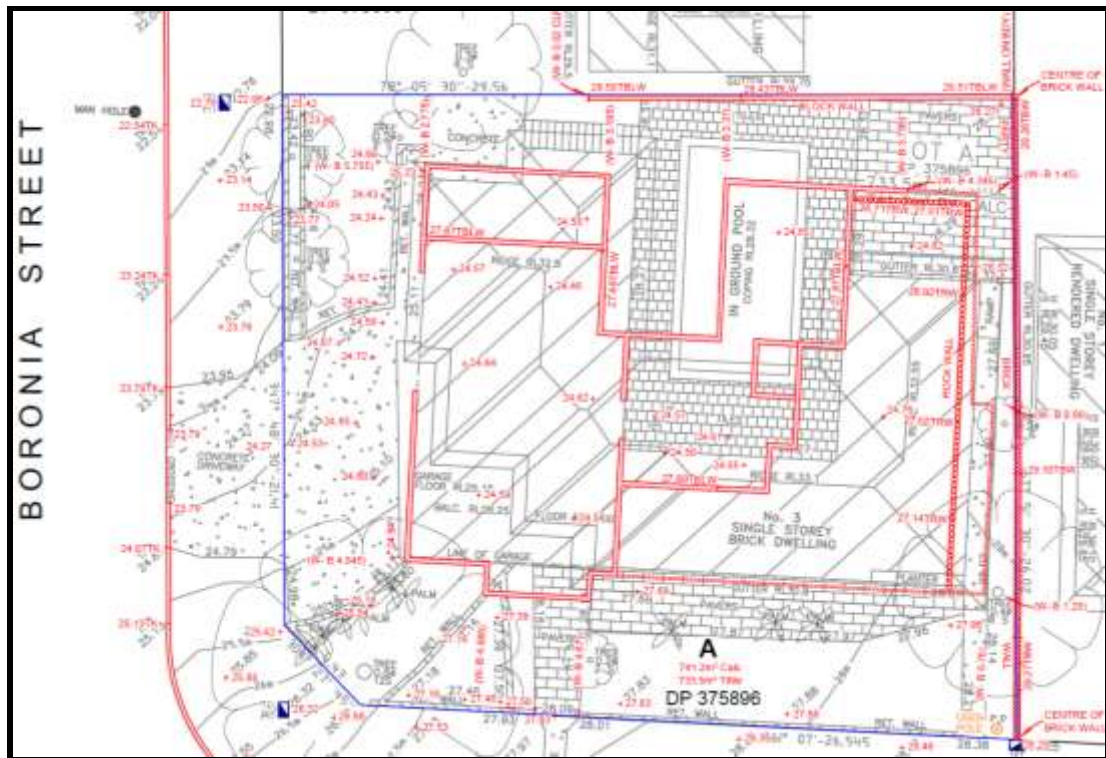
Works-As-Executed Plan (Source: Avenue Town Planning, 31/05/2022)
